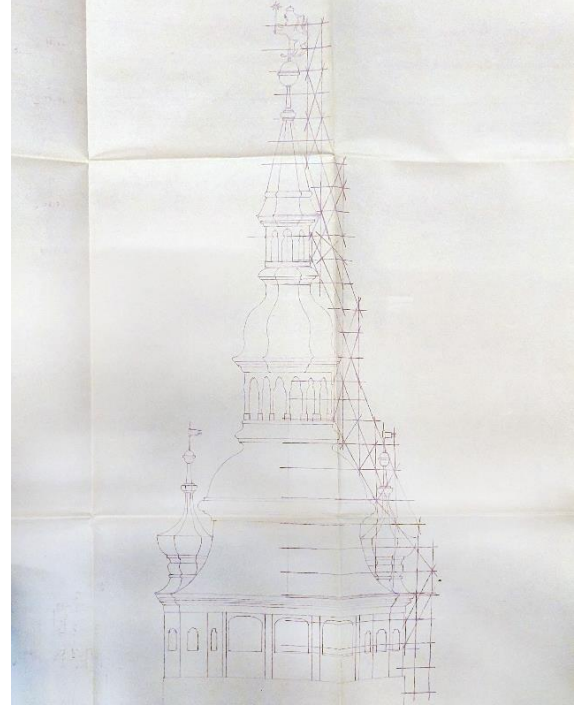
St. Vitus Church – perimeter scaffolding of the gallery – view of the scaffolding [24]
